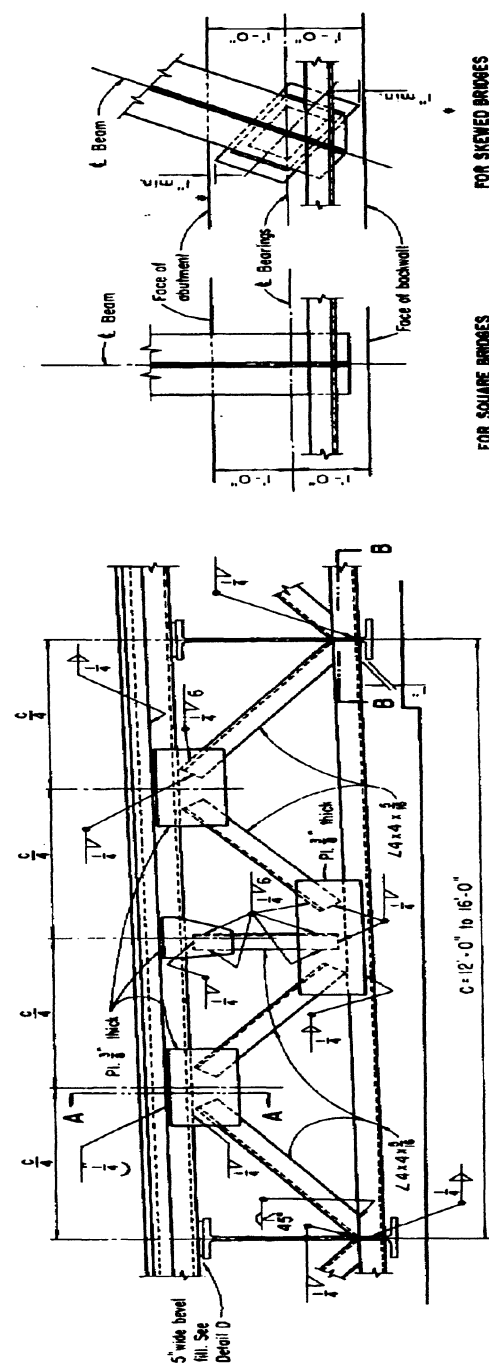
New York Diaphragm Details - Bridges with Straight Stringers, 1979
